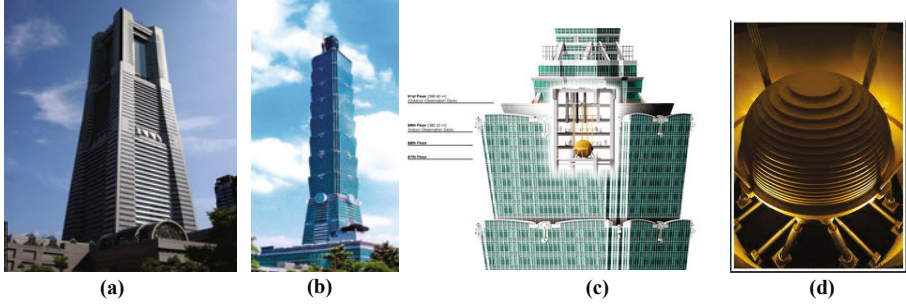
Buildings with the mass damper installed for structural control. (a) The landmark tower of Japan. (b) The Taipei 101 in Taiwan. (c) The illustration of how the damper has been installed into the Taipei 101 building. (d) The damper of Taipei 101 building.
